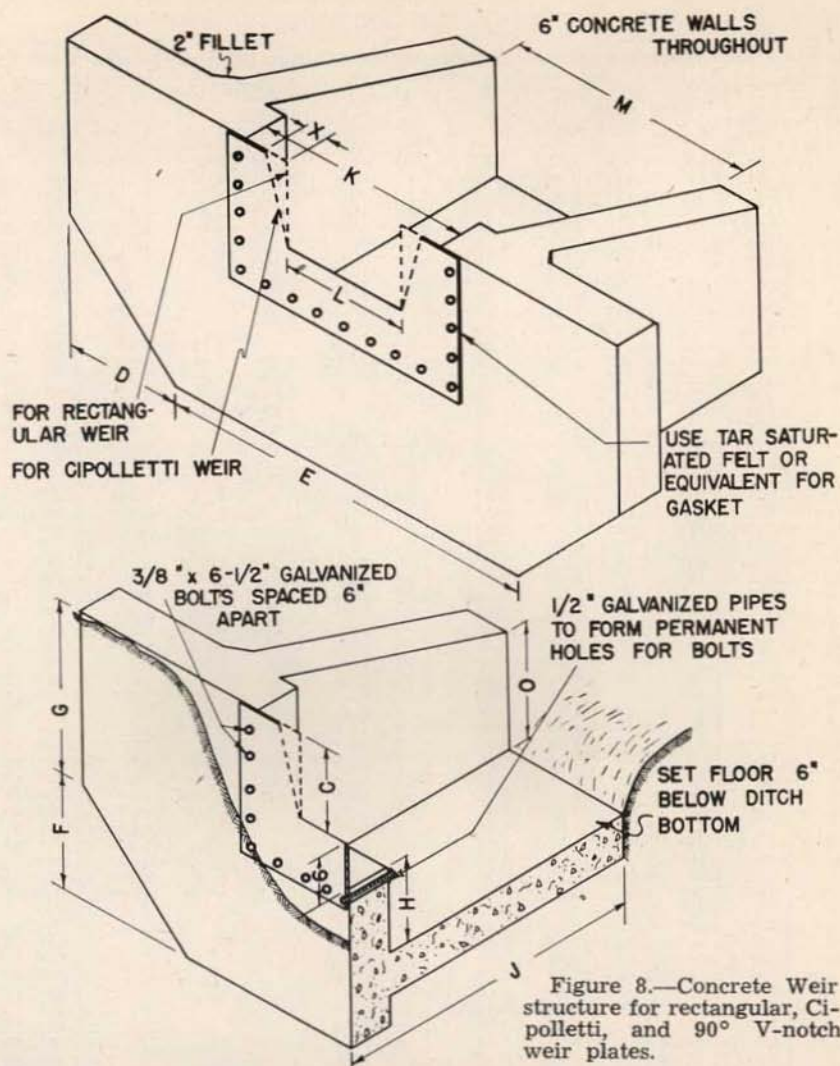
Concrete Weir structure for rectangular, Cipolletti, and 90° V-notch weir plates.
